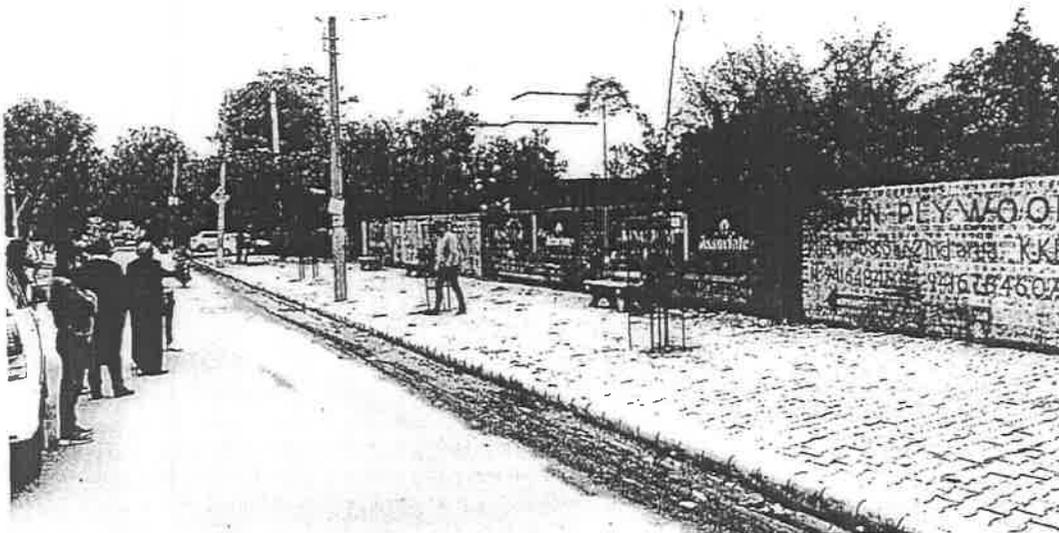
Photograph showing the sitting place made ready with concrete blocks along the road of sector-5, Kurukshetra
